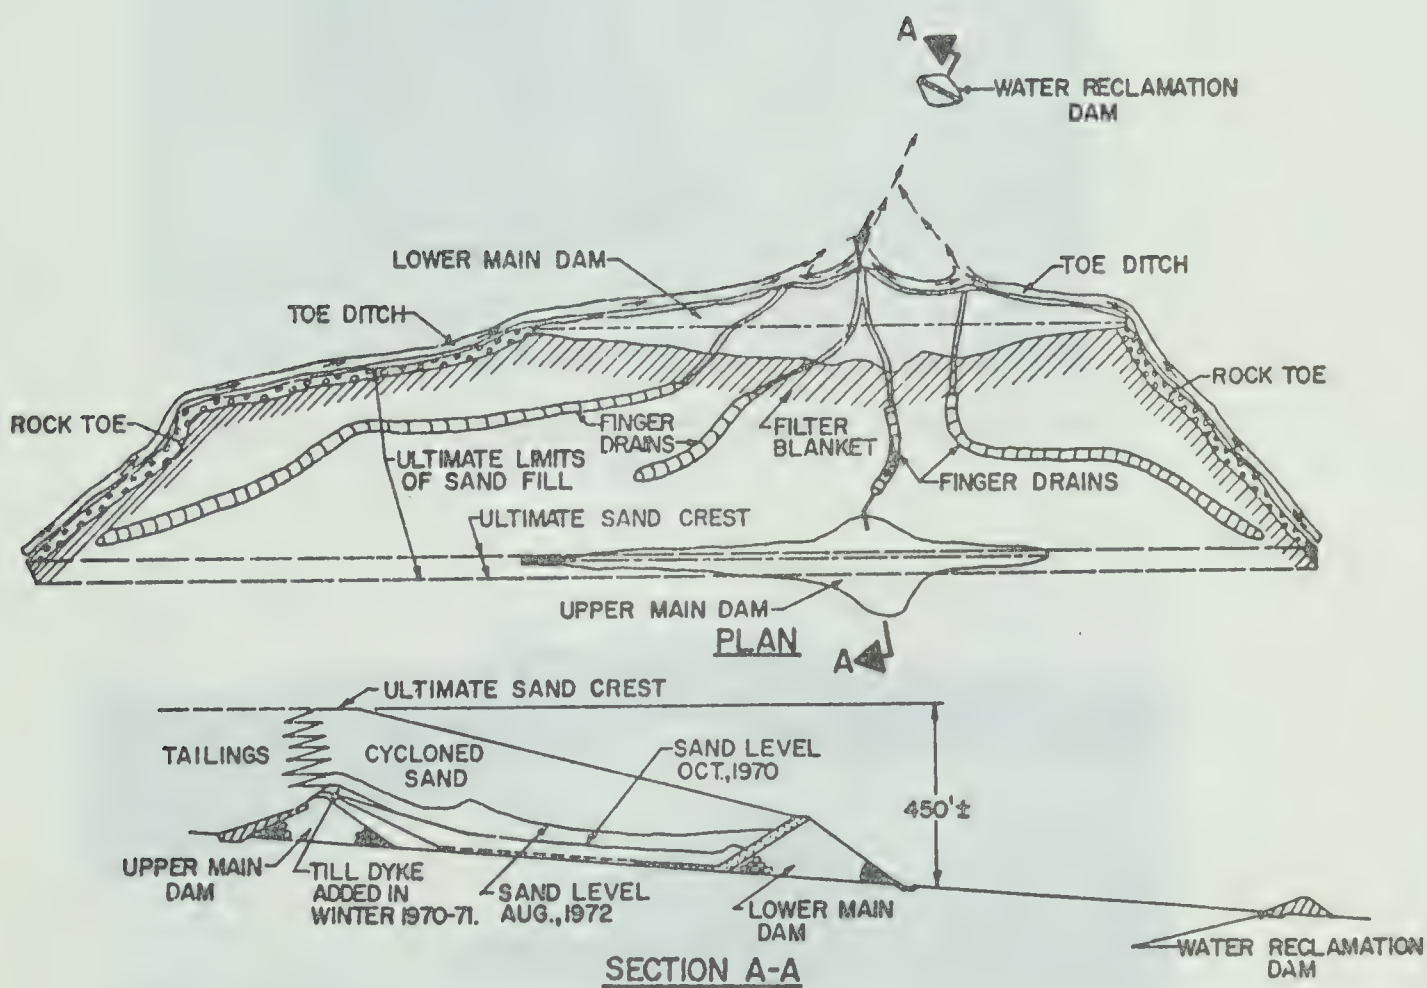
Brenda Tailings Dam (After Klohn and Maartman, 1973)
